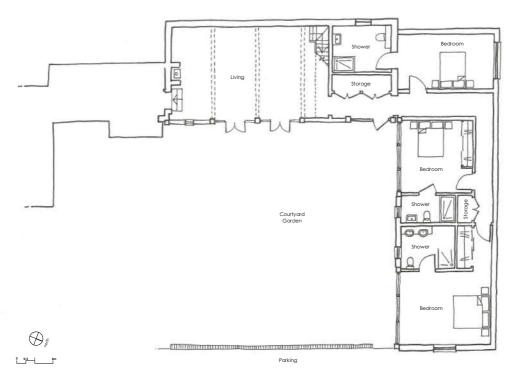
; Sketch of the proposed ground floor plan of the former cart shed, including the new wing.
